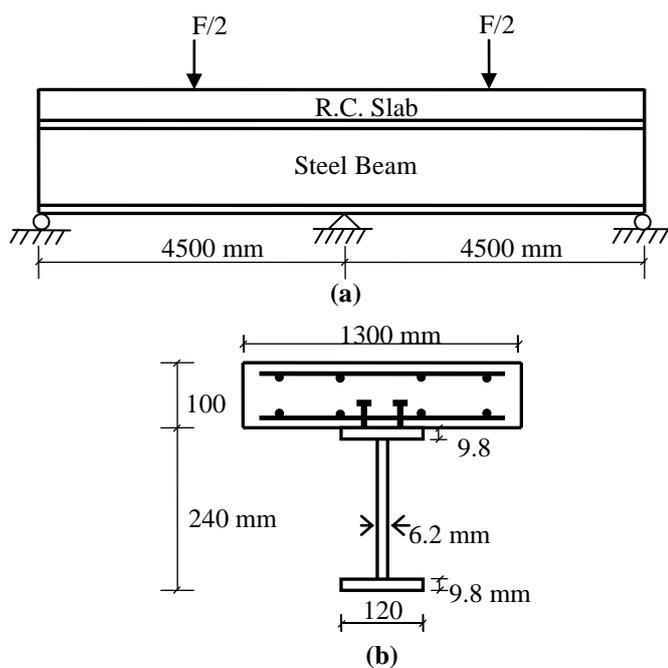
Ansourian continuous composite steel-concrete beam (CTB6) (a) Dimensions and loading arrangement (b) Cross section [Ansourian 1981].
